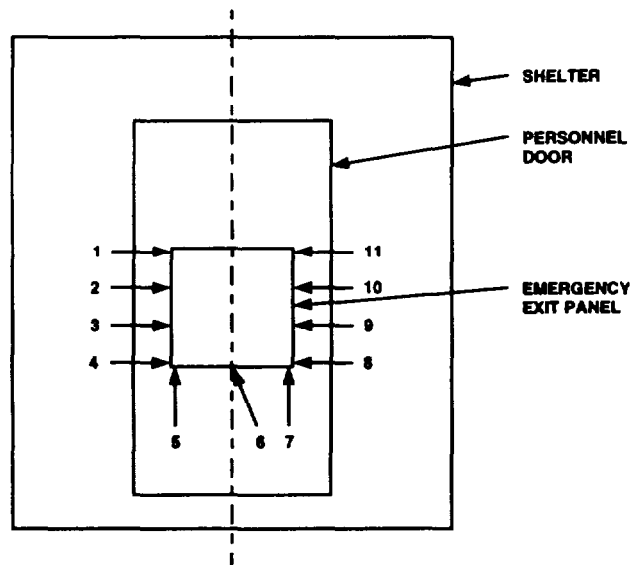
Typical Locations for Emergency Exit Panel Gasket Testing
